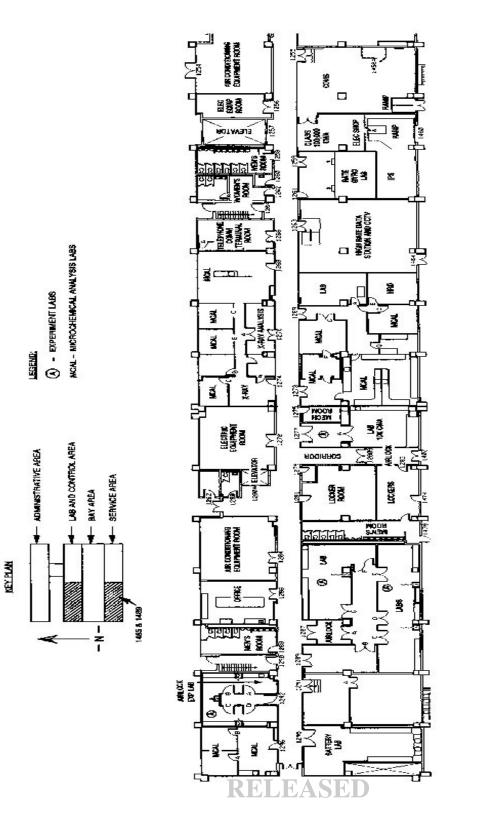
Layout of Laboratories and Shops, First Floor, West O&C Building
